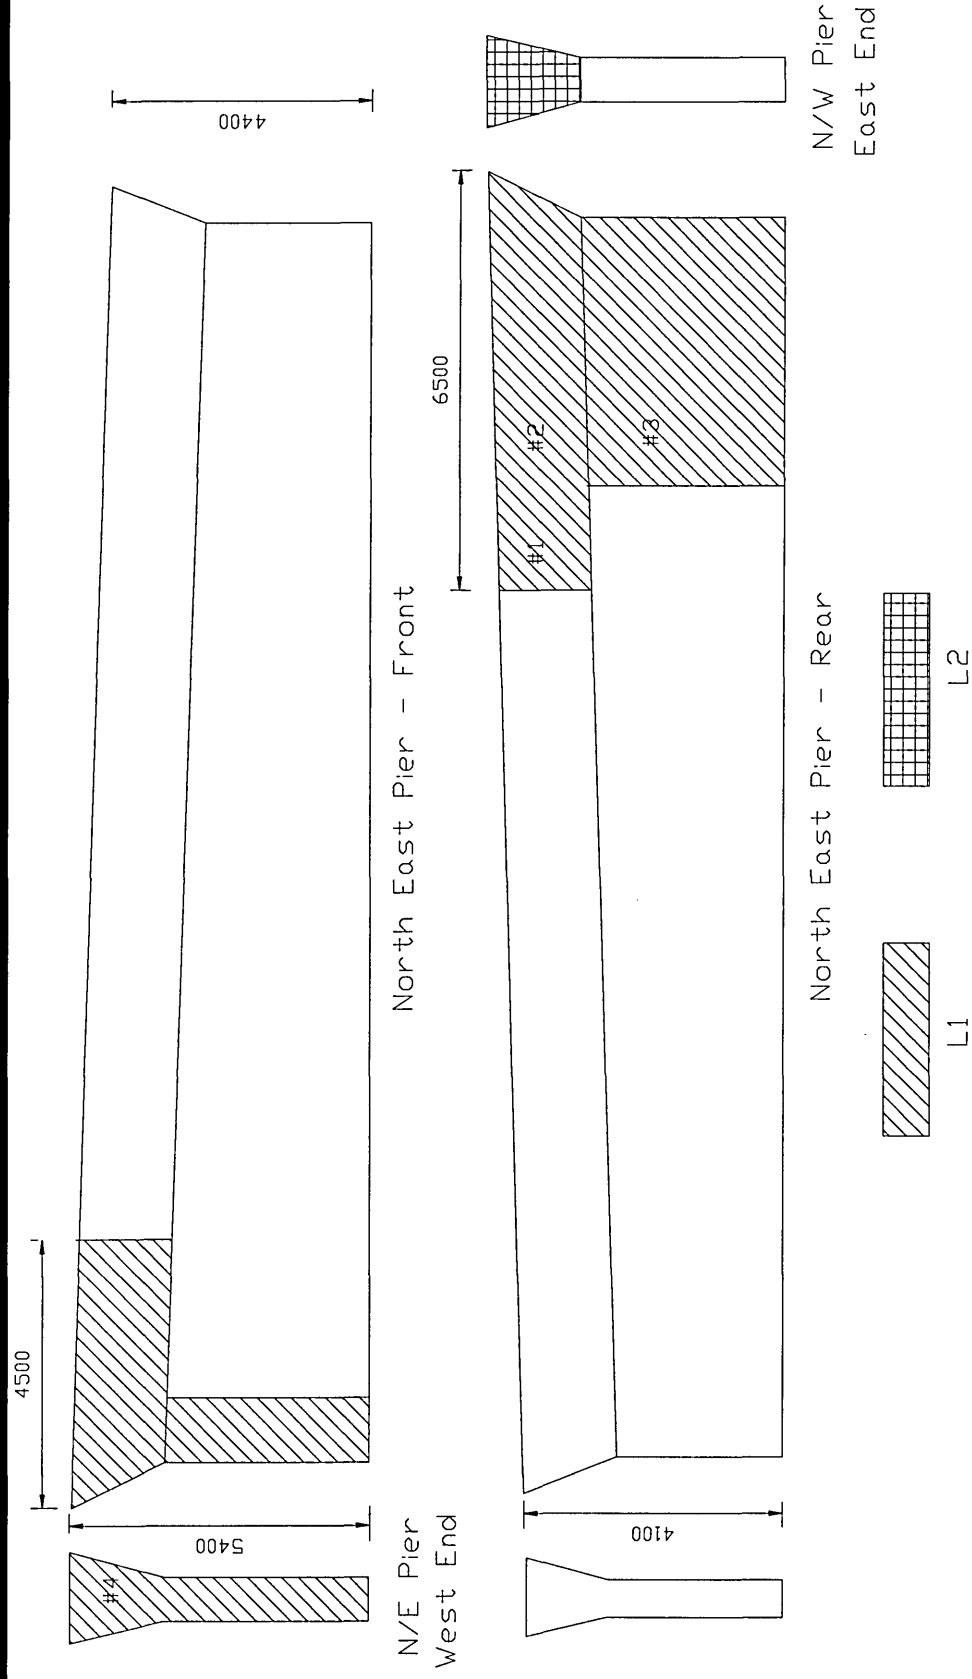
Location of instrumented materials on north piers at Lawns Lane Bridge
